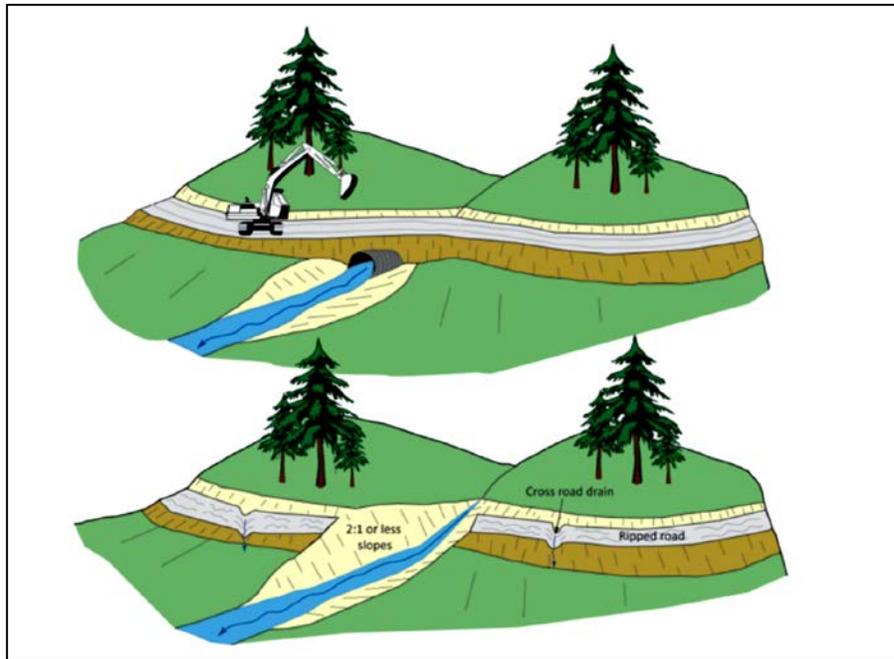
Schematic of road decommissioning and stabilization (Weaver et al., 2014).
